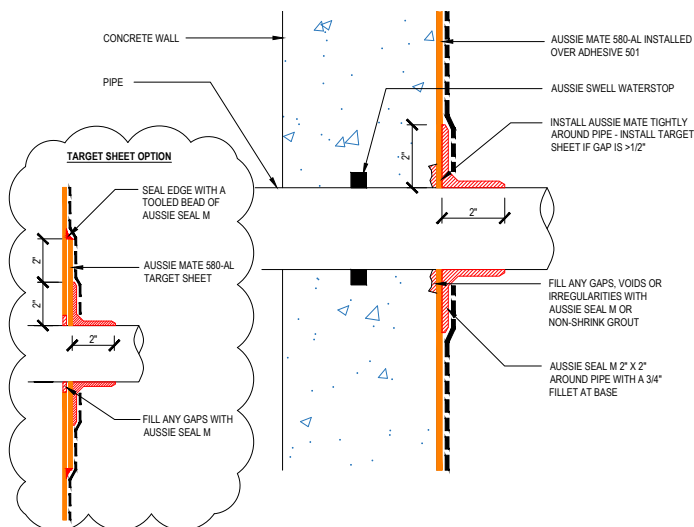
TYPICAL PIPE PENETRATION
